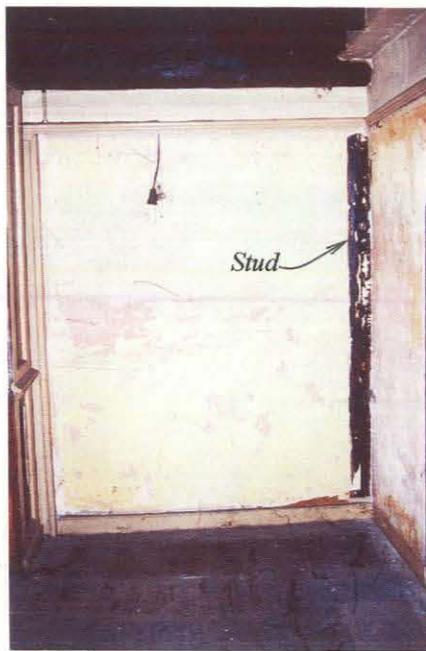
Front room 65/1, no.65; west end of the south wall featuring a single, upright timber in the western corner of the room.
